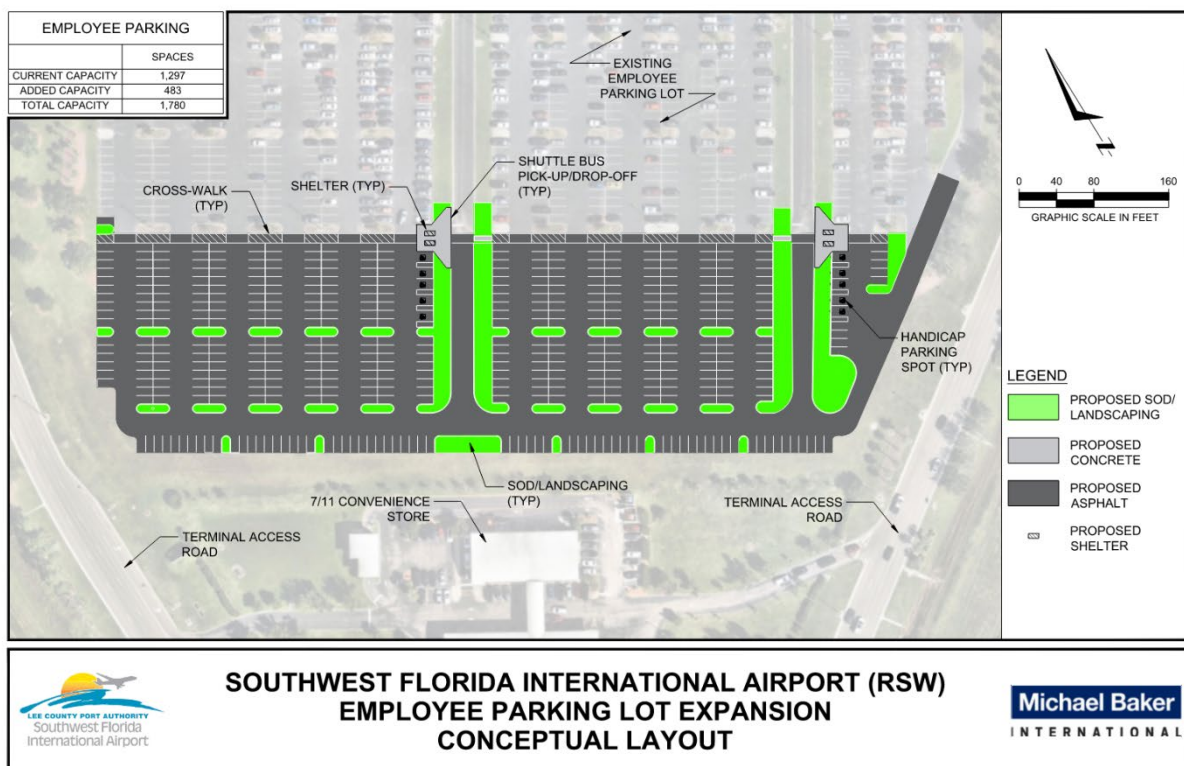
Employee Parking Lot Expansion Conceptual Layout
